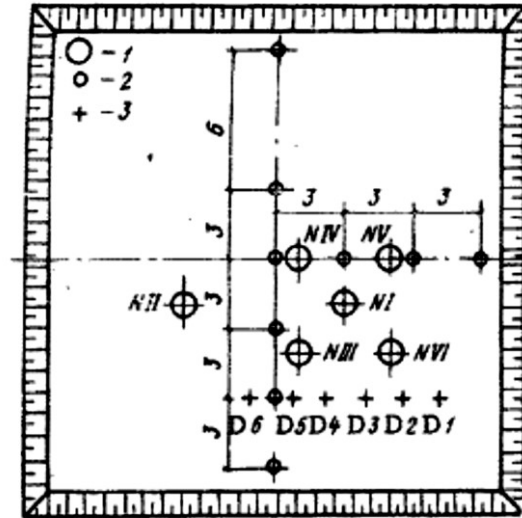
Plan for piles and depth markers (Grigoryan and Grigoryan 1975)
